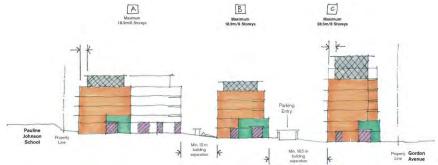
Conceptual Sketch of Street Wall and Building Massing Along 22nd Street
